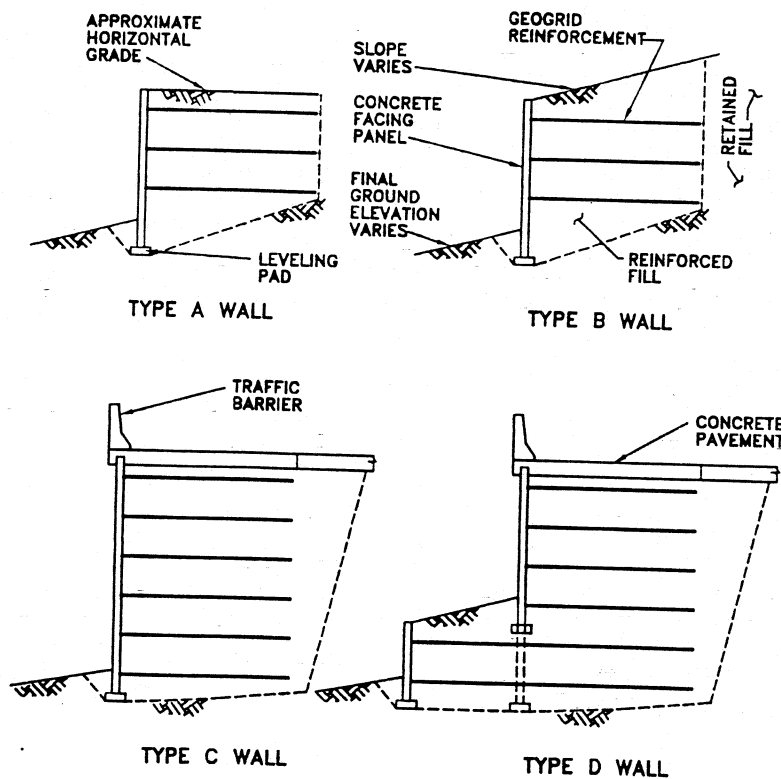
Typical Geogrid-Reinforced Wall Cross-Sections
